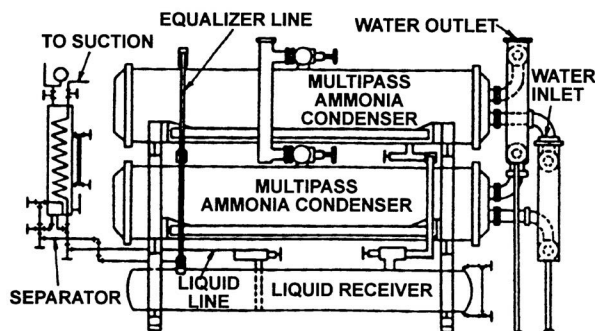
Horizontal Shell-and-Tube Ammonia Condenser and Receiver
